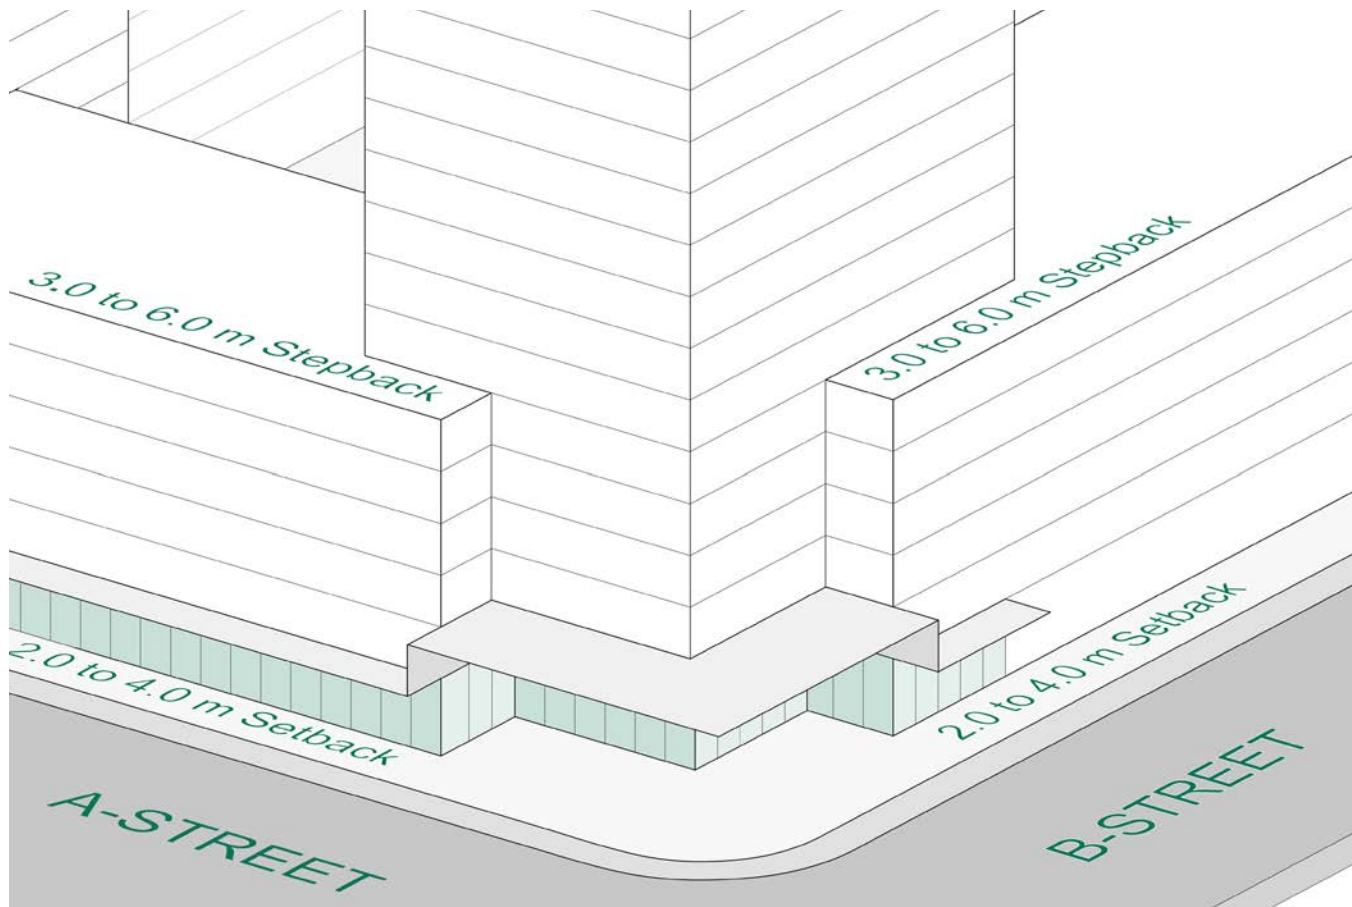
When A and B Streets intersect, commercial uses should wrap around the corner while the tower setback should step back
